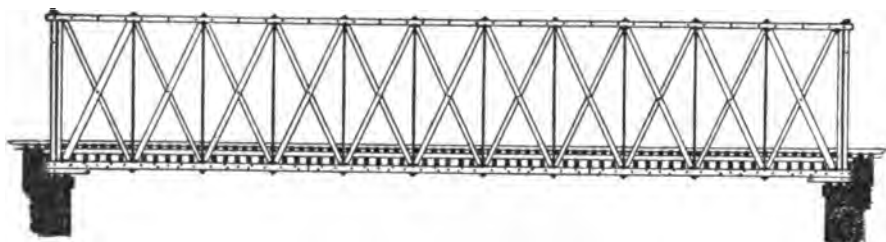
A Howe Truss Bridge of about 120 Feet Span.
